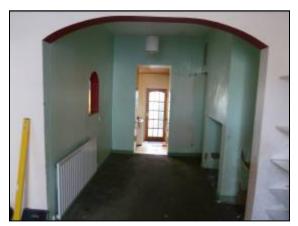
Existing opening in dividing wall and opening down into the kitchen
